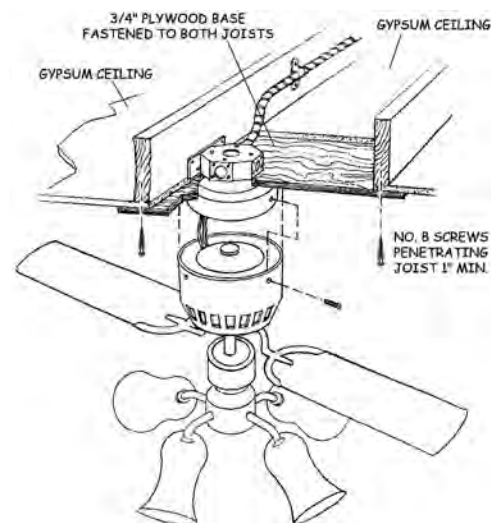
CEILING FAN MOUNTING WITH PLYWOOD MOUNTING BASE
